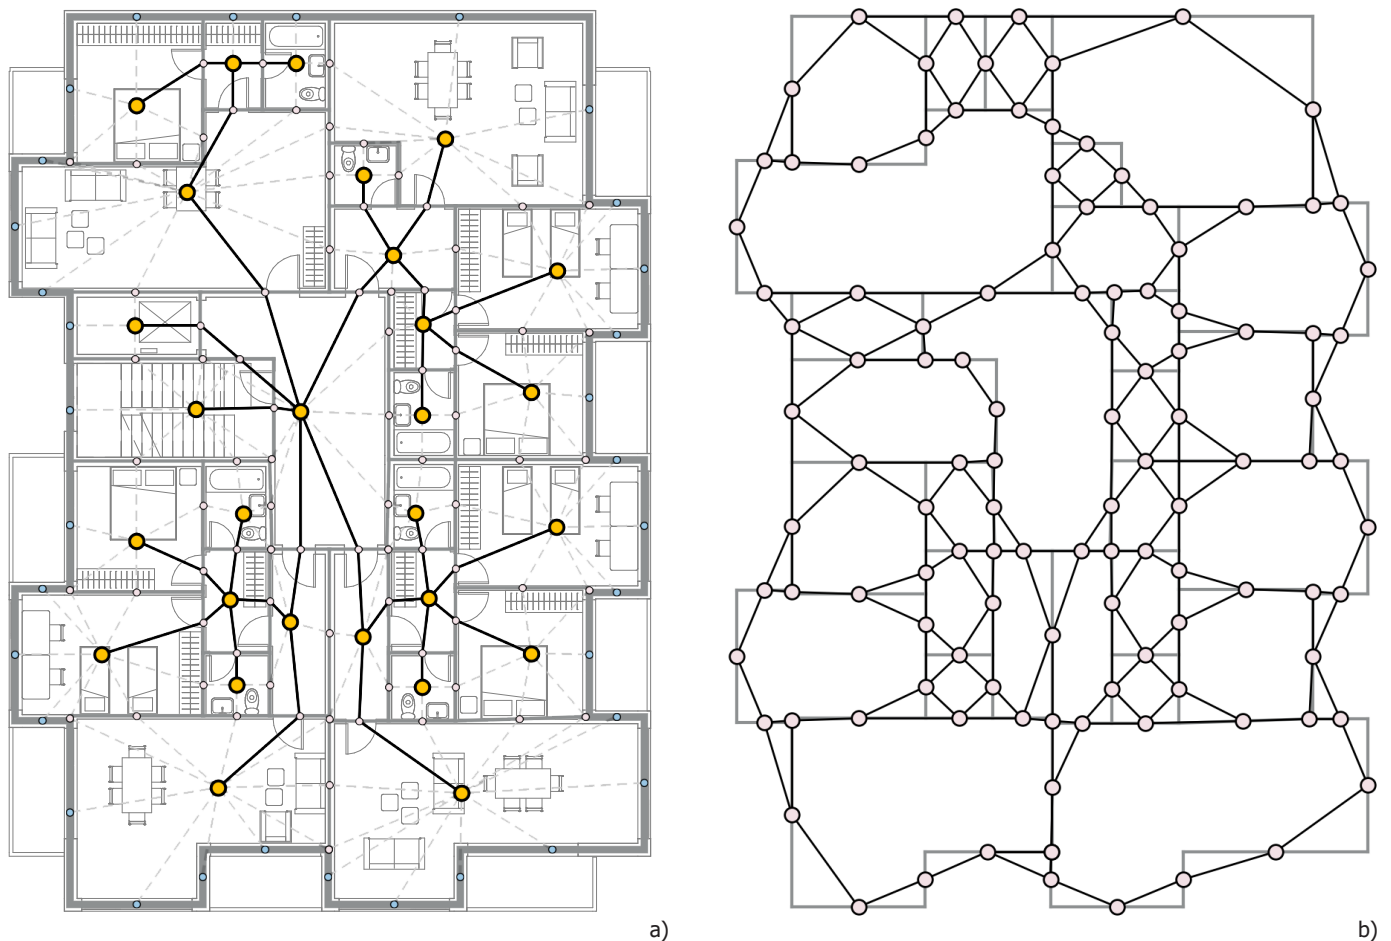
Room and wall connectivity extraction from a floor plan of a residential building:
